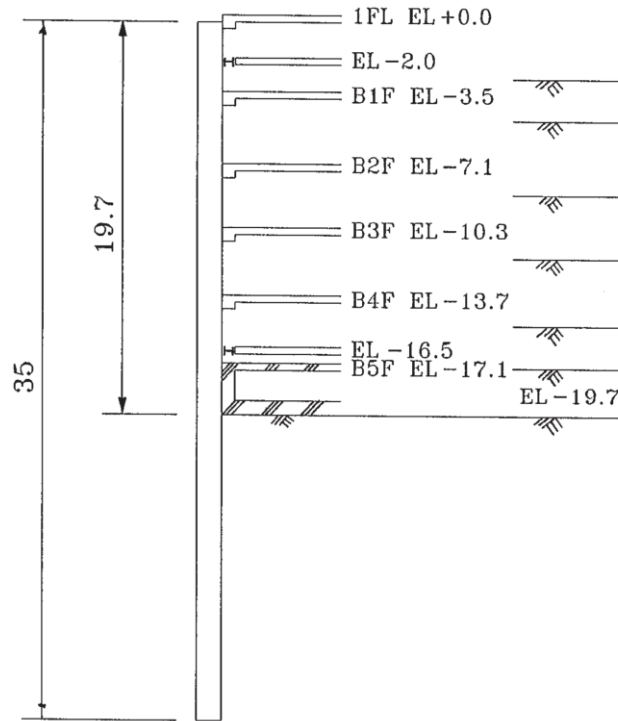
TNEC Excavation Project Cross-Section (Ou, Shiau, & Wang, 2000)
